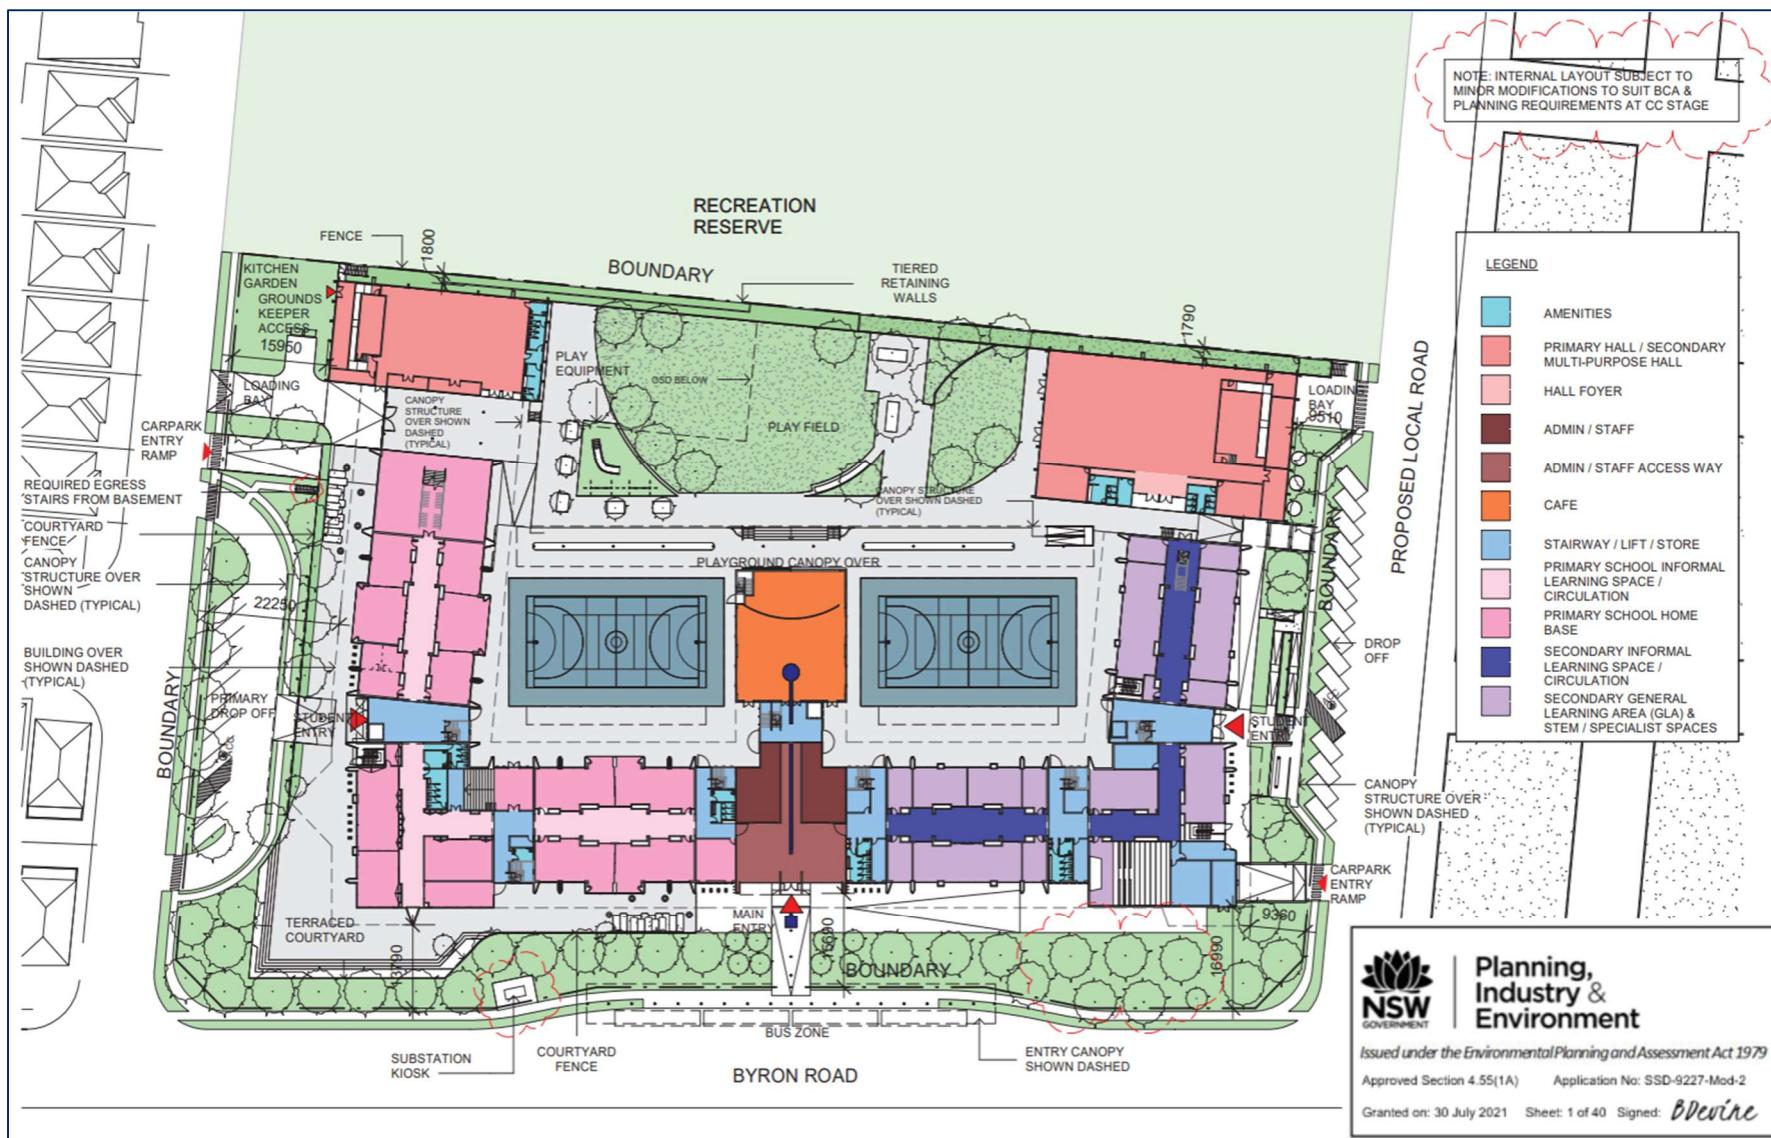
| Approved Site Plan (Source: SSD-9227-Mod-2 Approved Plans)
